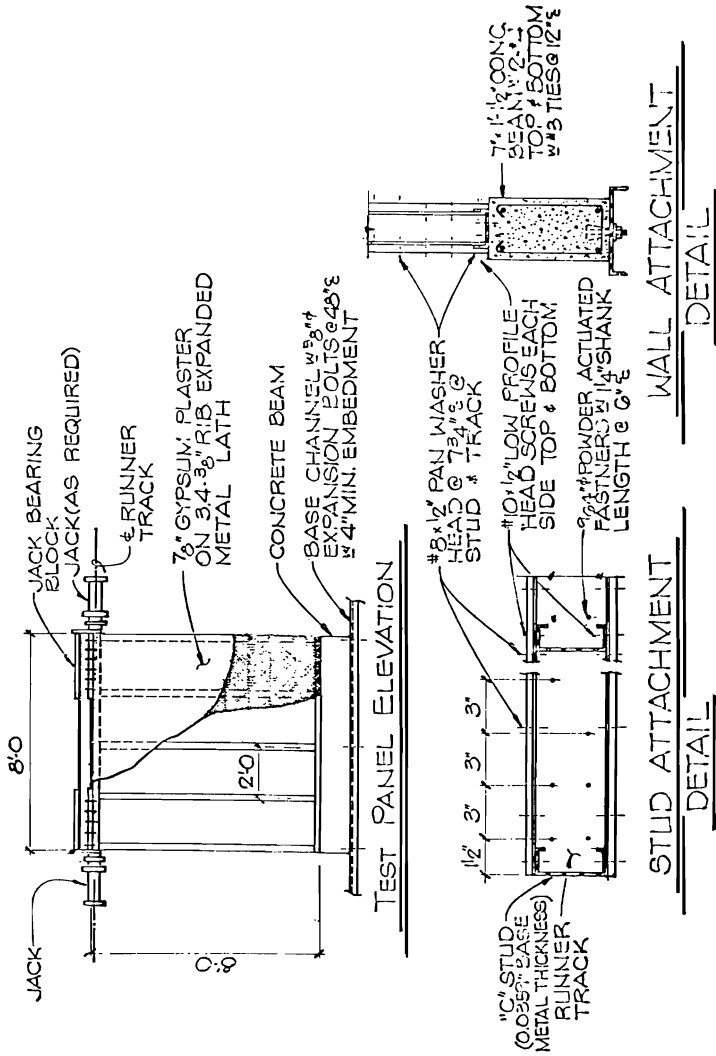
Test Assembly Plan & Details - Wall Type "J"
